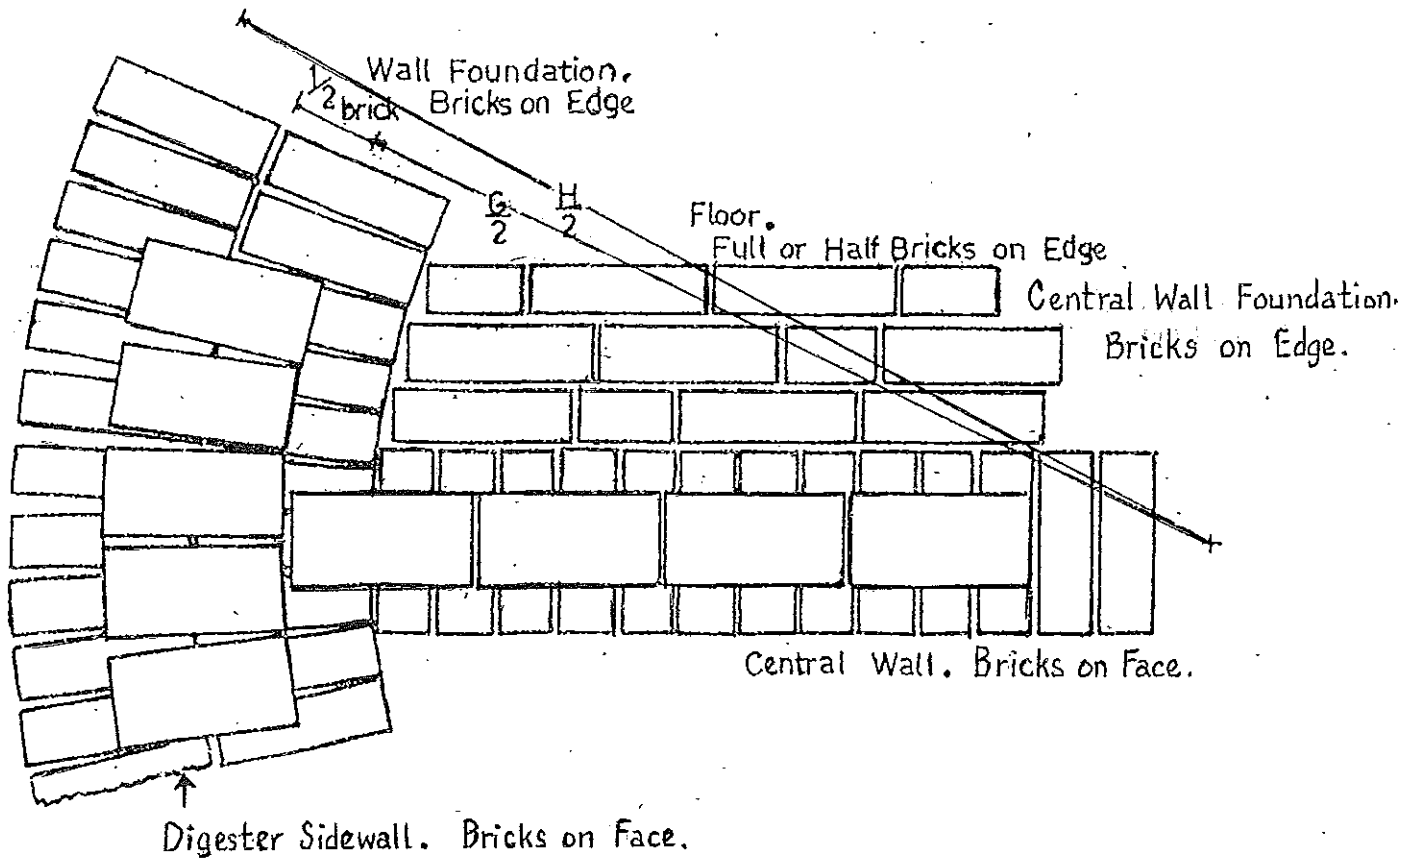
Layout of Bricks for the Floor of Drum Plants
